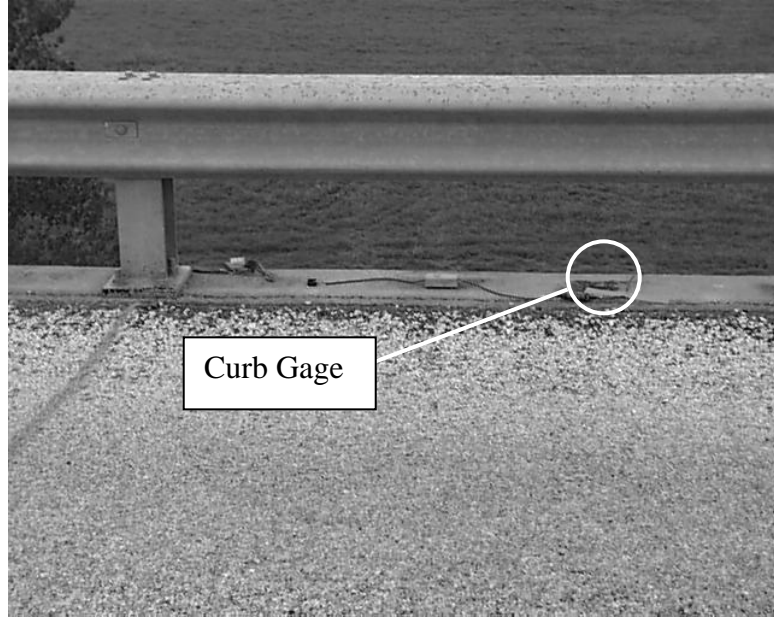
Strain Gage Locations – Wimberley Bridge – Span 2
